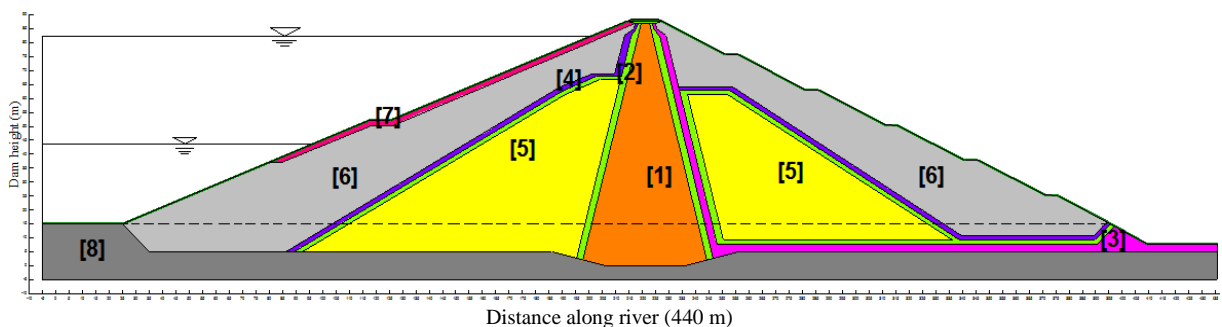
Ribb zoned dam typical cross section (scale 1:500)
